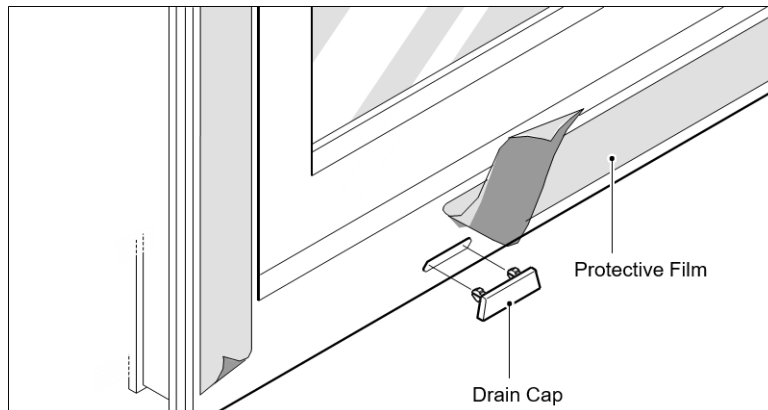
How to remove the protective film and install the drain caps- exterior view
